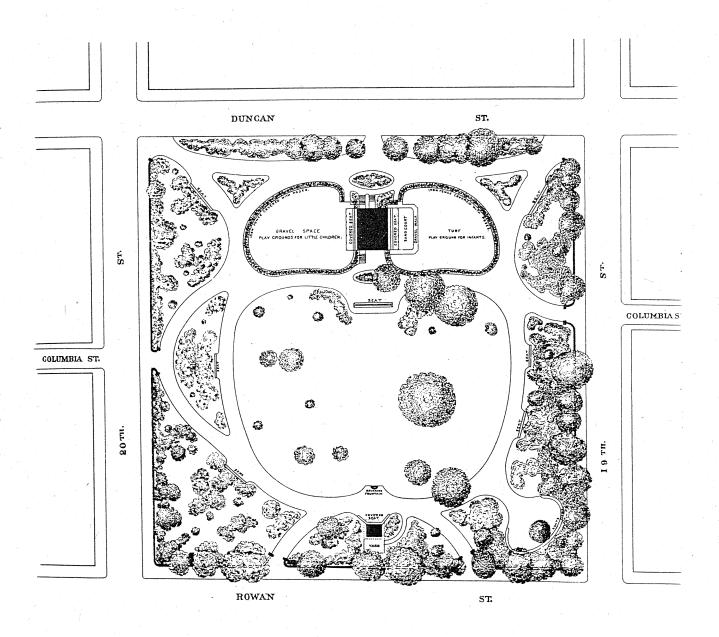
Plan of Boone Square, Louisville, KY, undated. Courtesy Beveridge collection.
